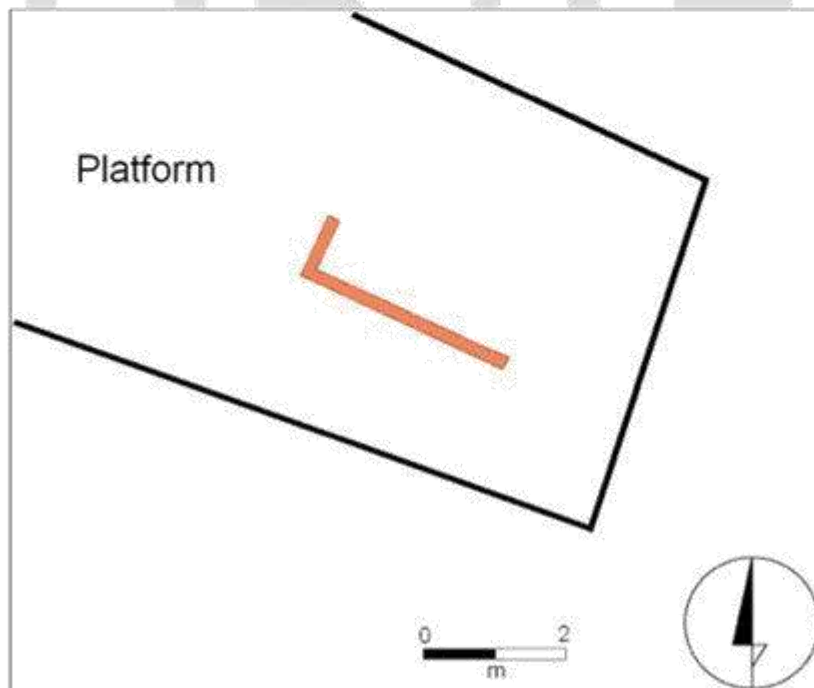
Plan of the brick footing exposed during the resurfacing of the platform (Extent 2018:6)
